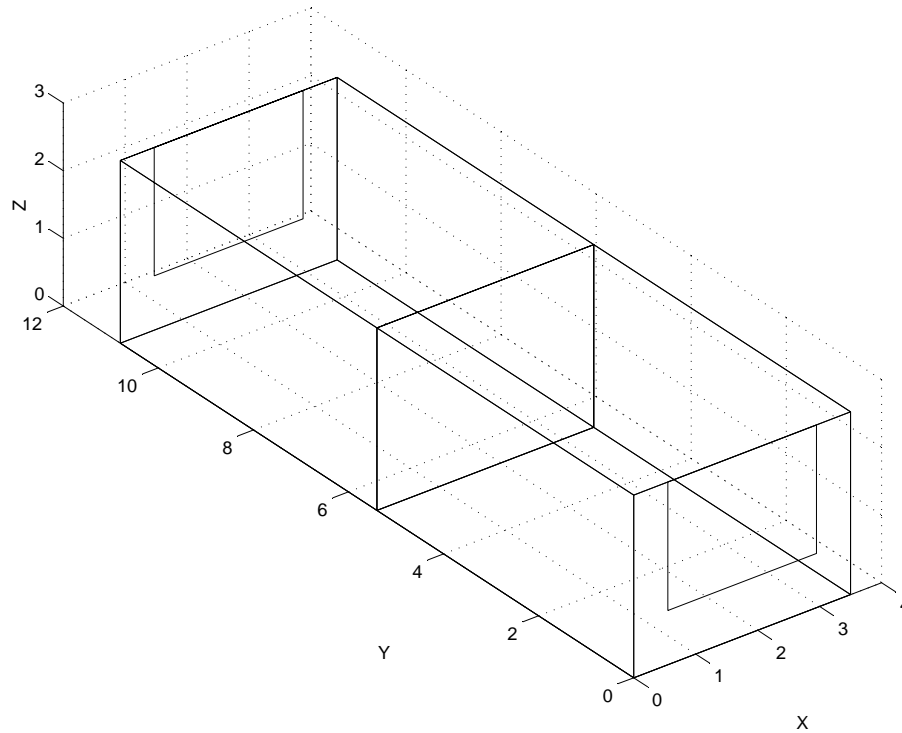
Schematic geometry of the section in the office building with two opposite facing office rooms.
